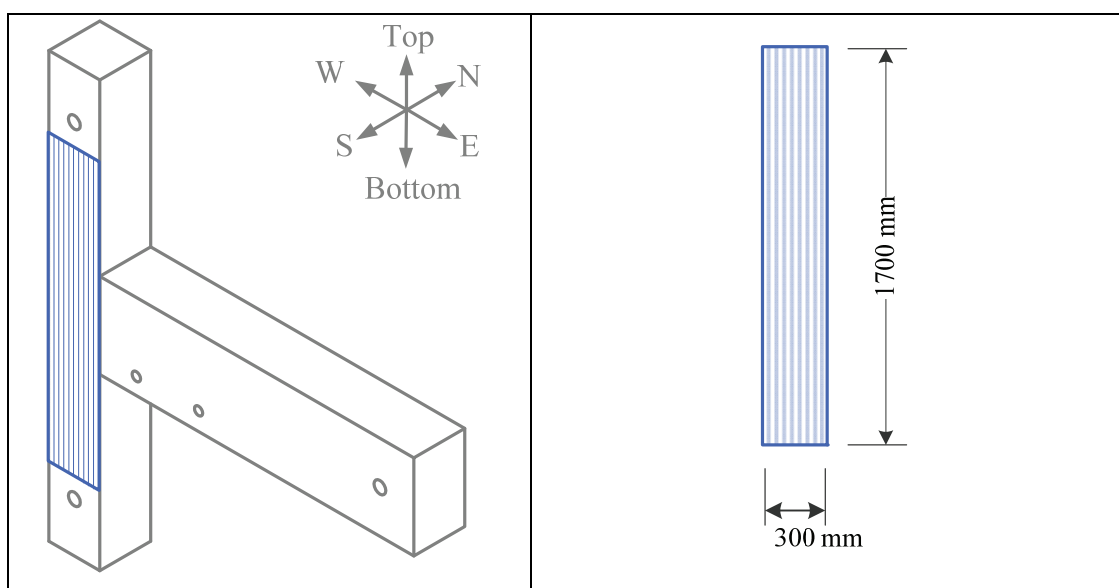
CFRP sheets used as a column flexural reinforcement, step (ii)
